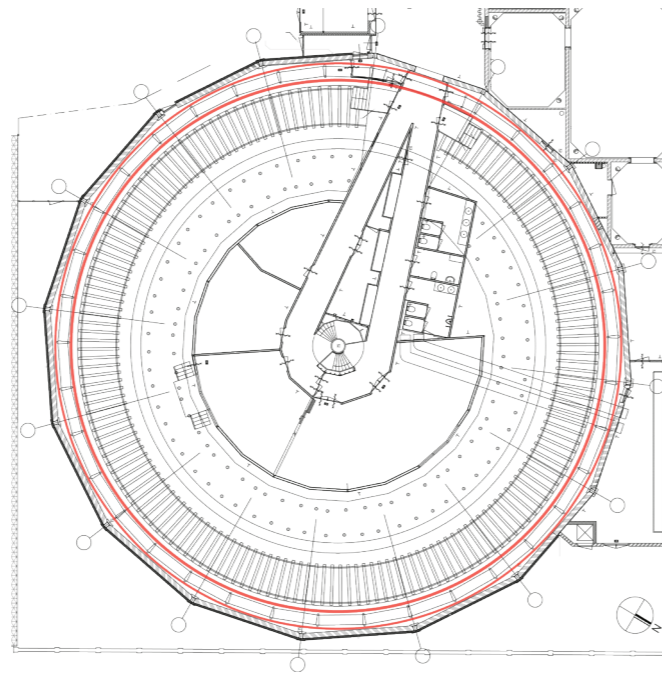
plan of the Rotonde with the area used for an installation connected to the scaffolding and the interior side of the façade (source: own).
